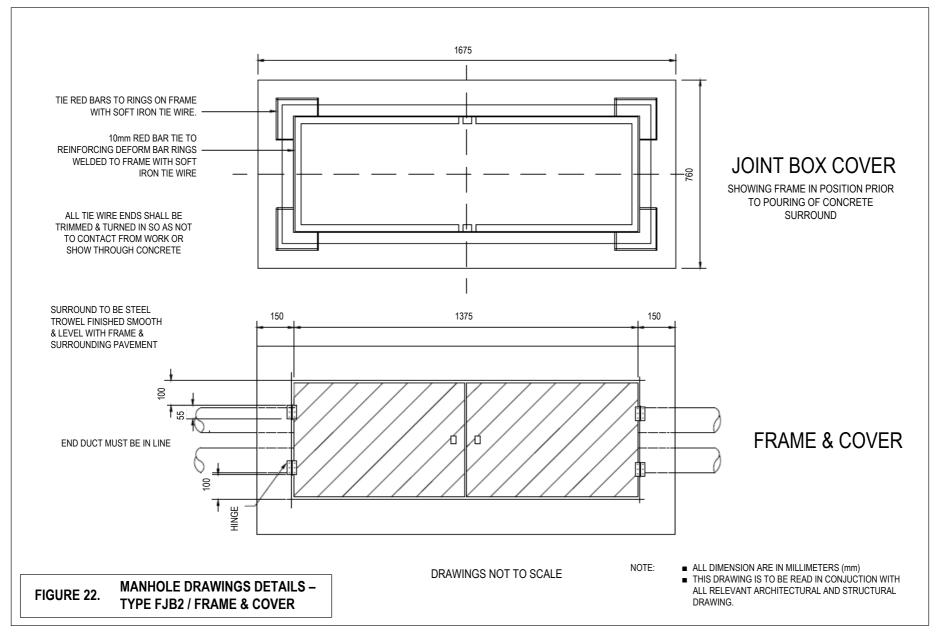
Manhole drawings details – Type FJB2 / Frame and cover
